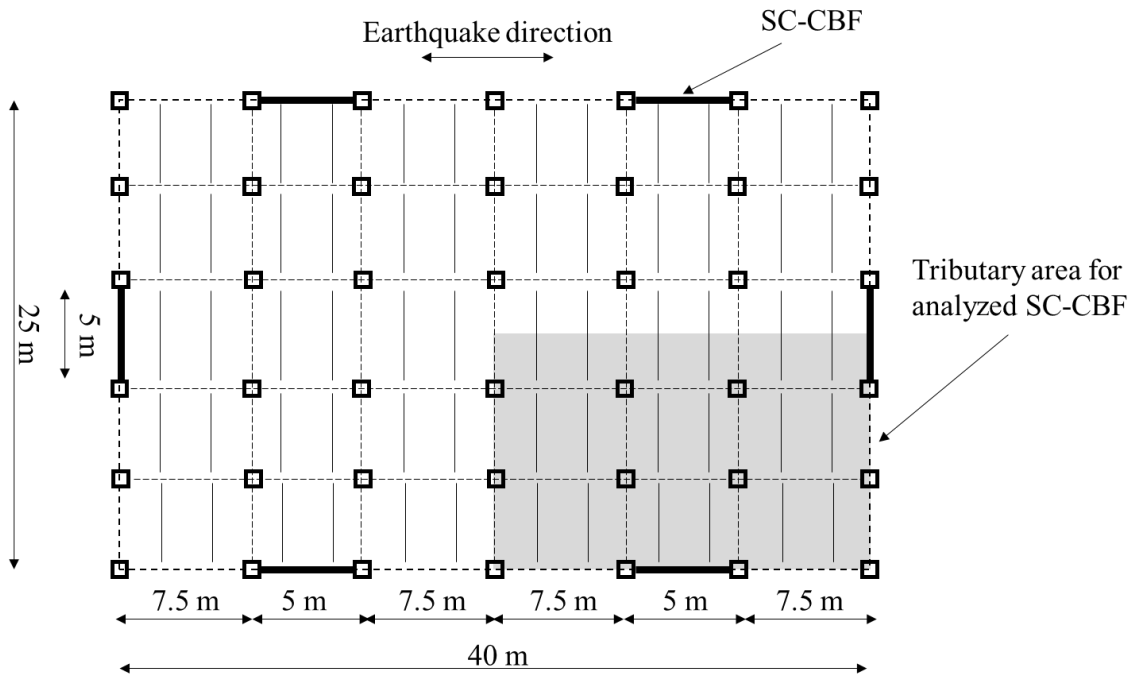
Floor plan of 15 story building with SC-CBFs.
